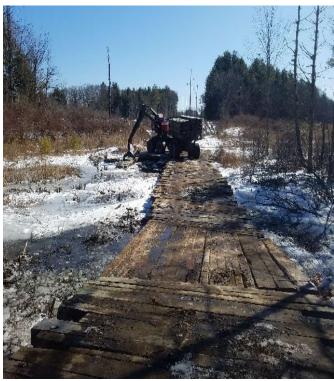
Building access road through wetland NW17 and NW51N. Viewing east. (02-21-20).
